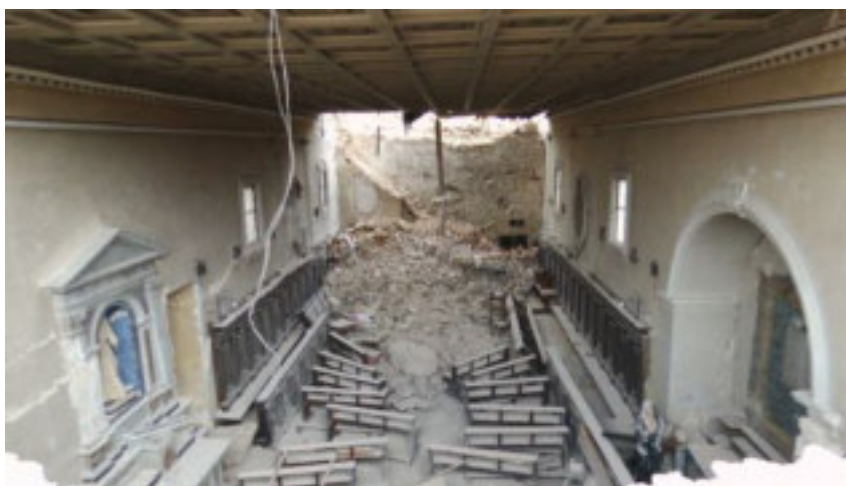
Norcia – Structural check inside of the Santa Maria degli Angeli Church.
